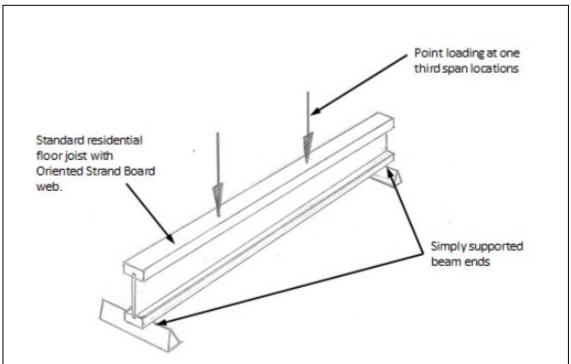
SCHEMATIC DIAGRAM OF ENGINEERED TIMBER JOIST IN FOUR POINT BENDING
